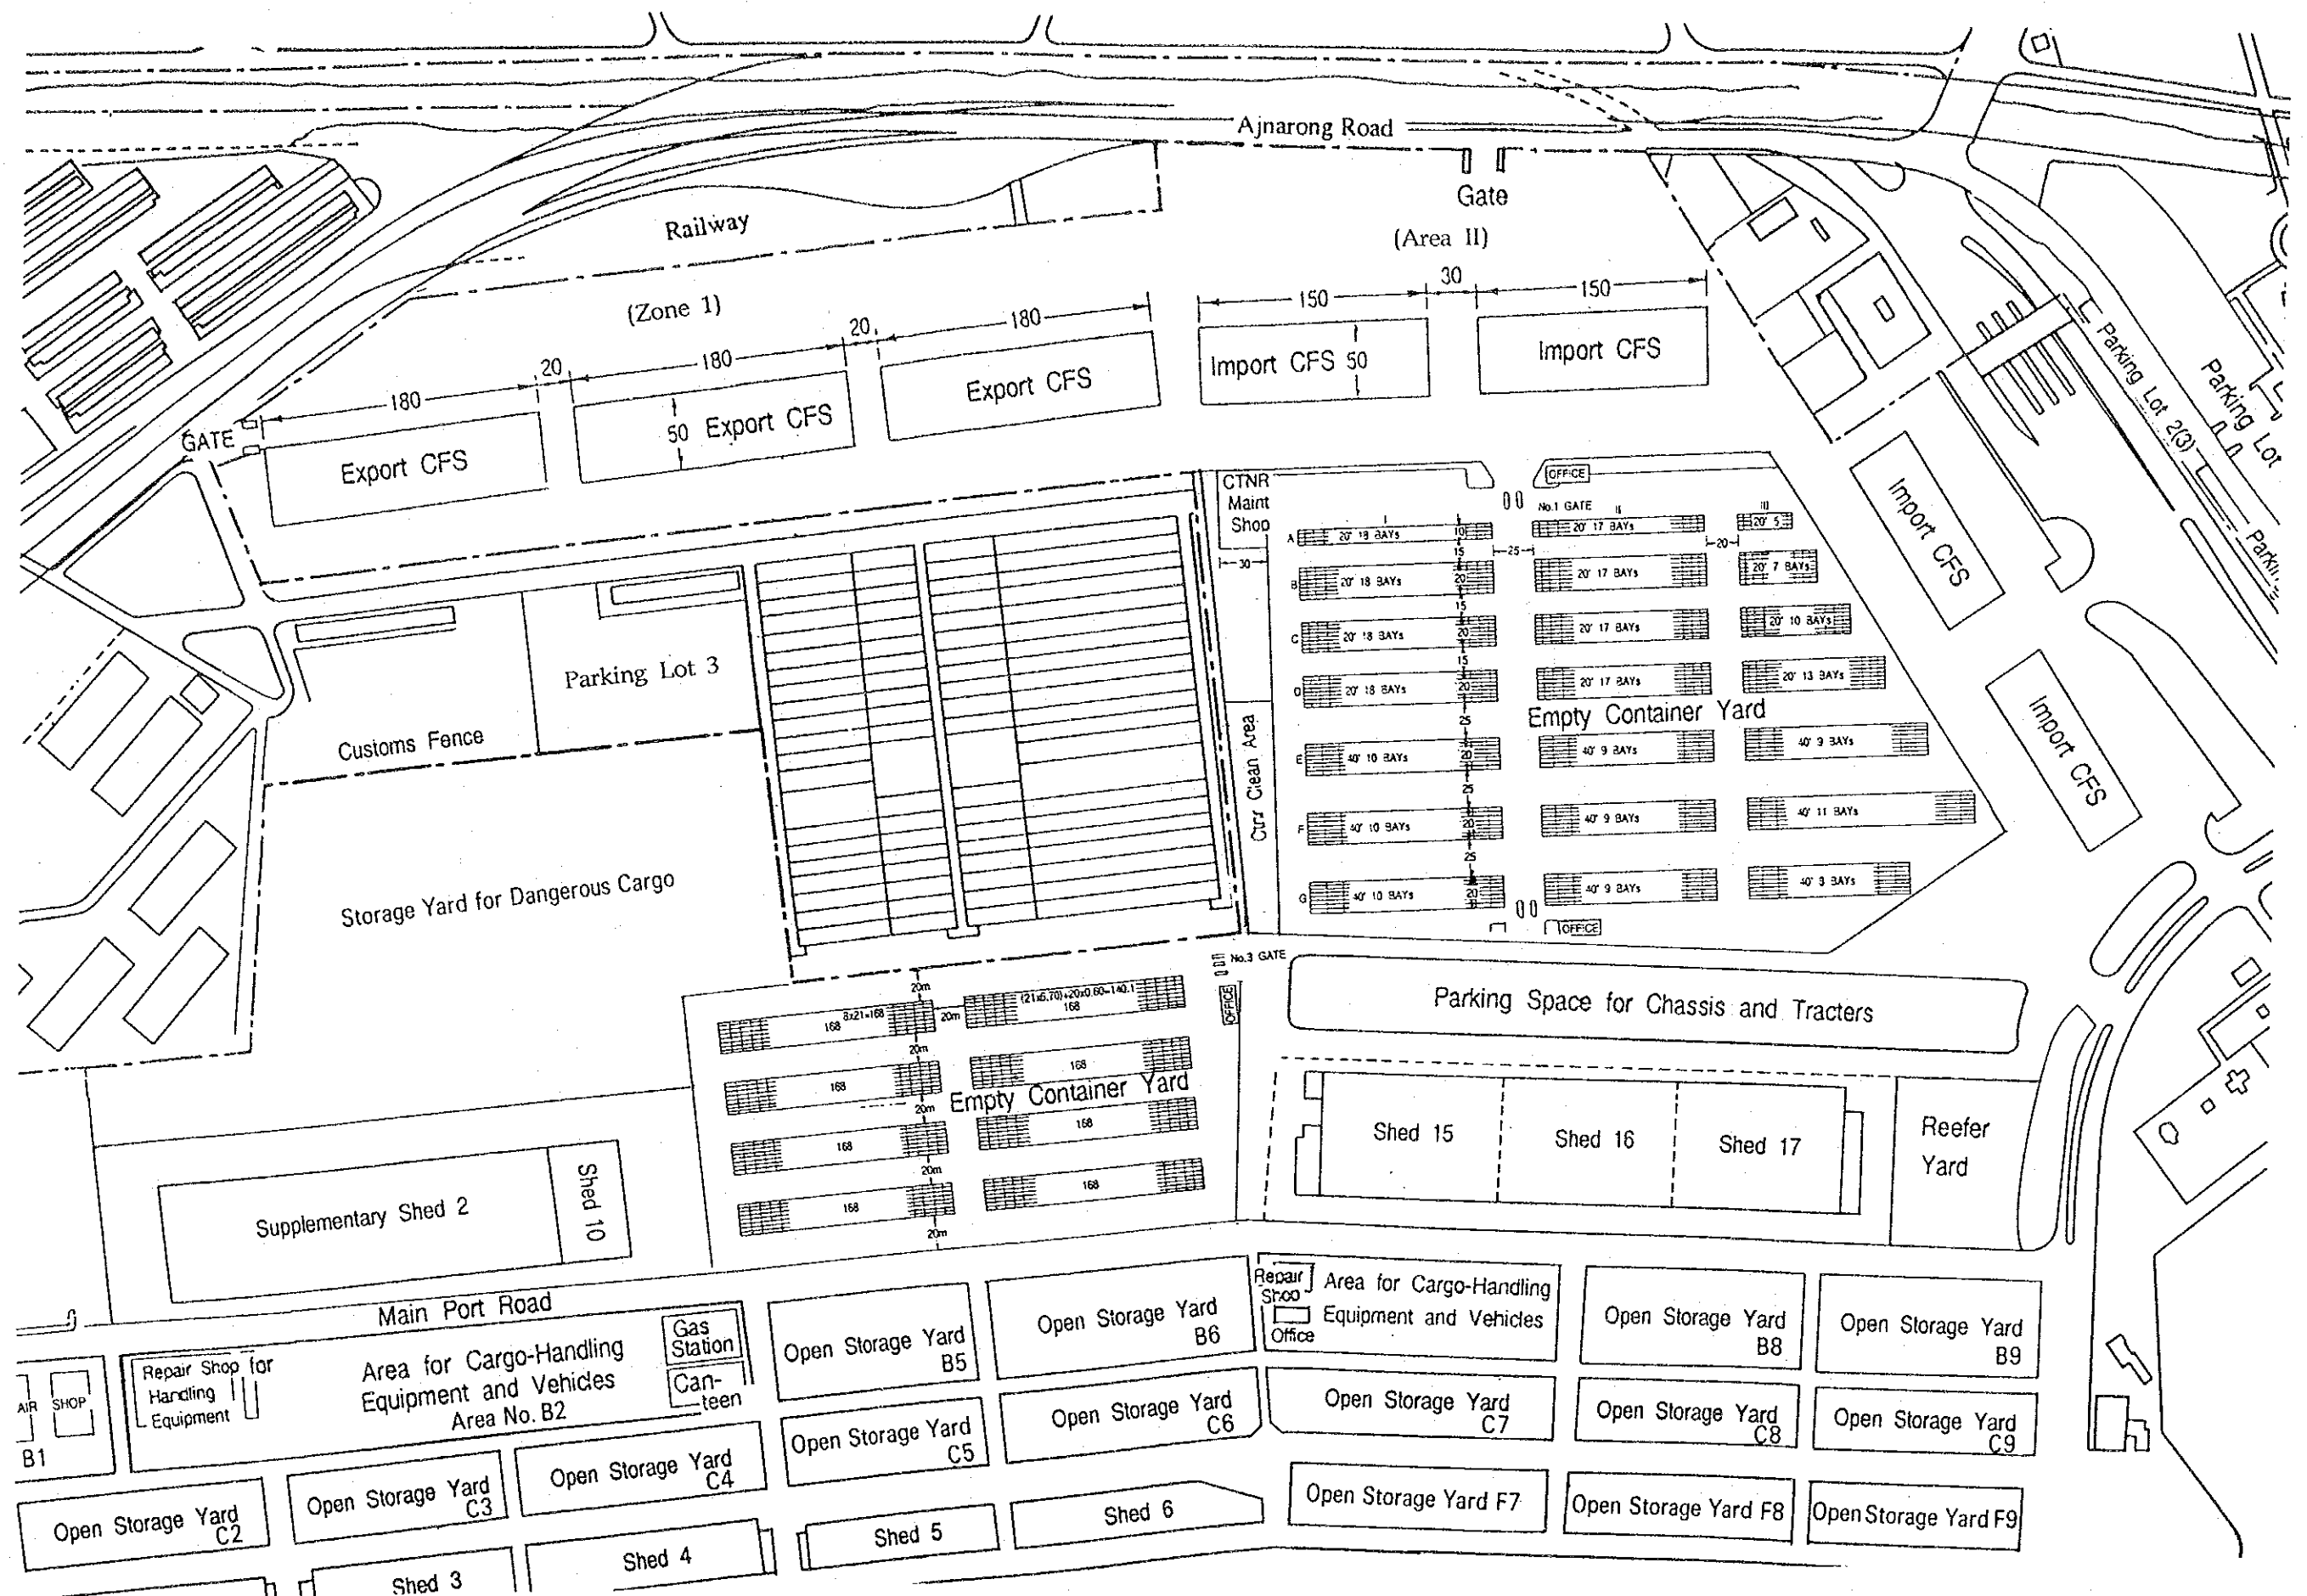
Modernization Plan of the West Quay for Container-Handling
